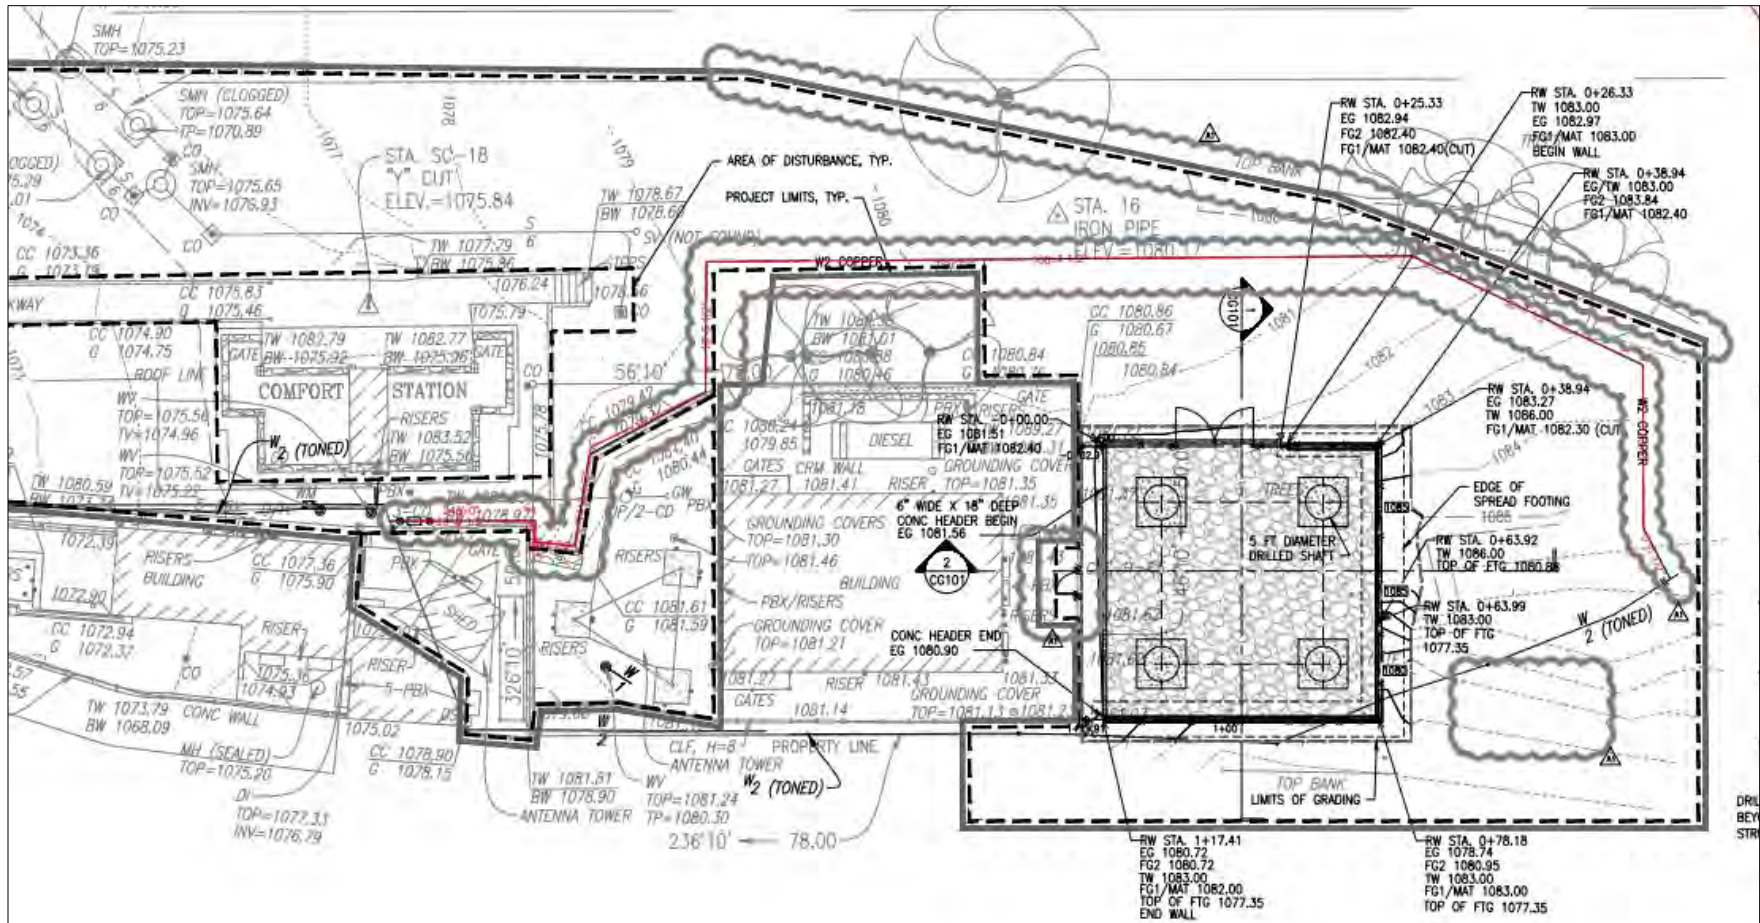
Design plans with the footprint of the proposed new waterline illustrated in red (Bowers + Kubota Consulting, Inc., 2024)
